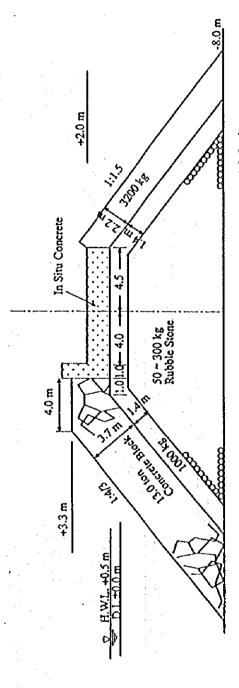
Standard Cross Section of Breakwater (-8.0m)
